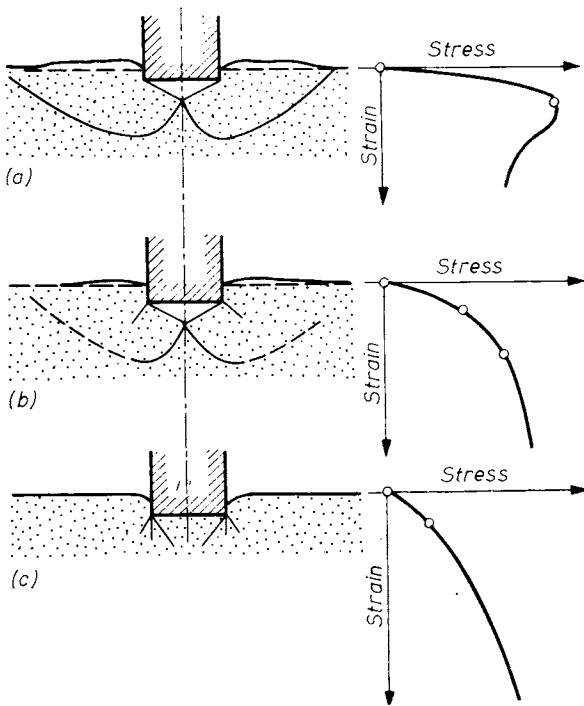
Main types of failure: a — total shear failure; b — partial (local) shear failure; c — penetration failure
